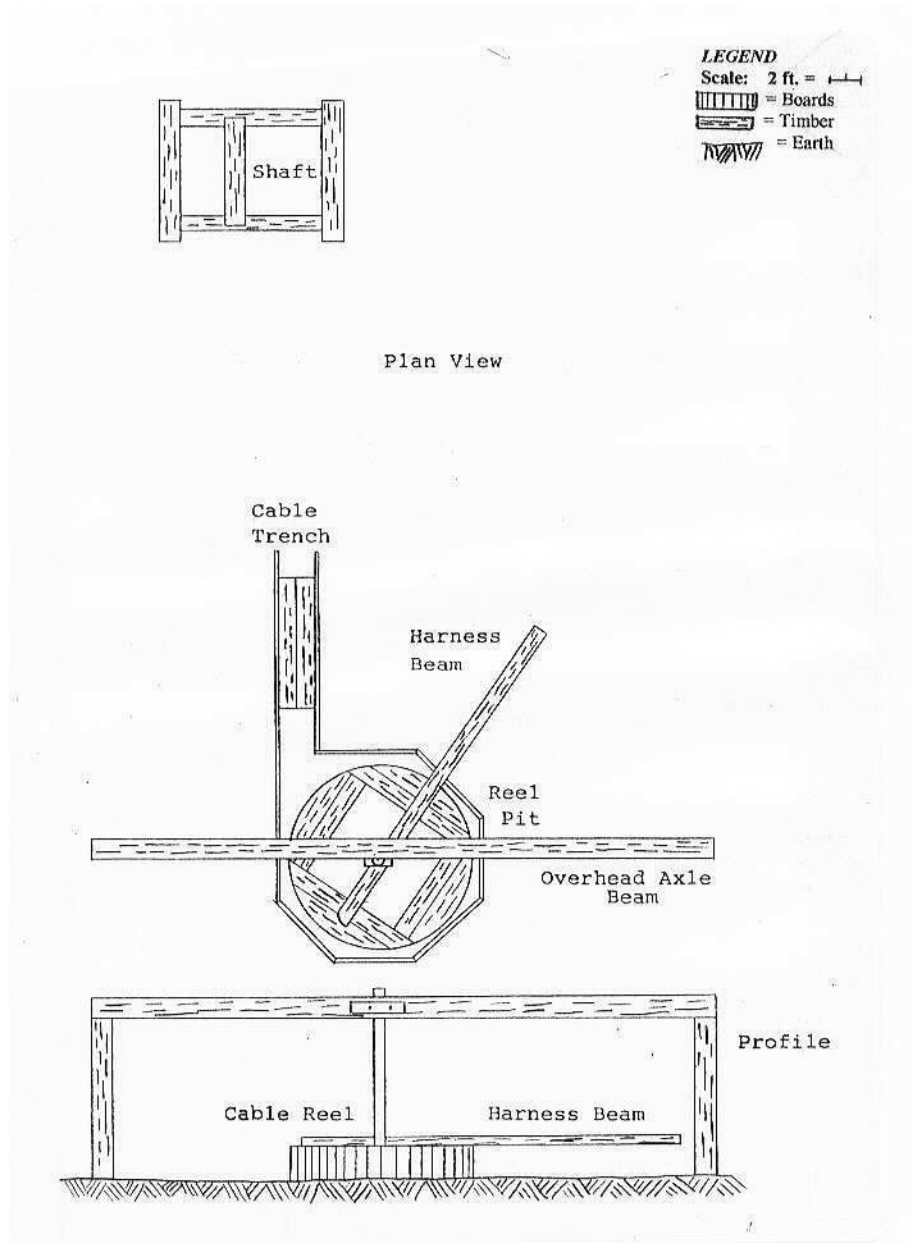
The plan view, top, and elevation, bottom, depict a horizontal reel horse whim, which was a universal prospecting hoist prior to the 1880s. Usually, only the reel pit and cable trench remain at prospect sites today. Source: Twitty: 2002:158.
